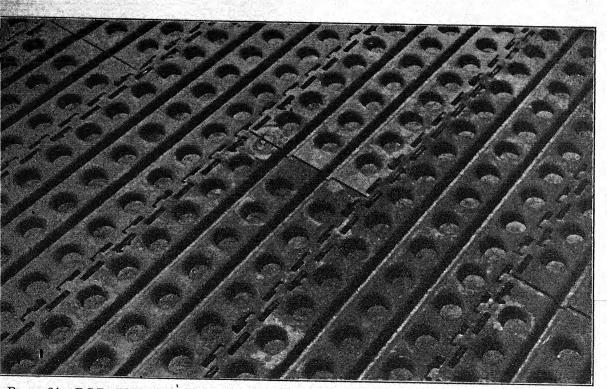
P.S.P. CONNECTED TO FORM A RUNWAY (ENGINEER BOARD, FORT BELVOIR, VIRGINIA)
